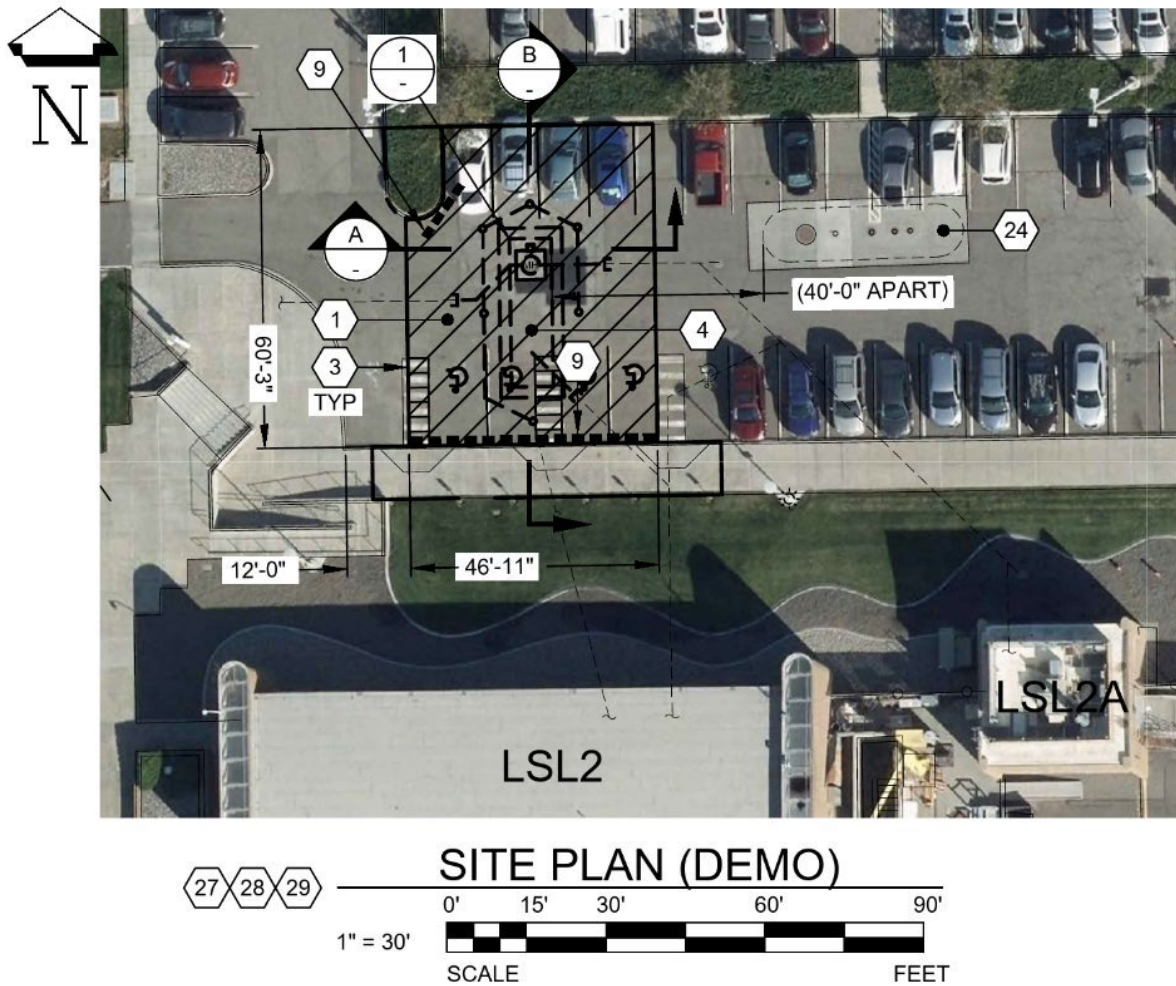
Site plan for the removal of 10,000-gallon underground storage tank.
